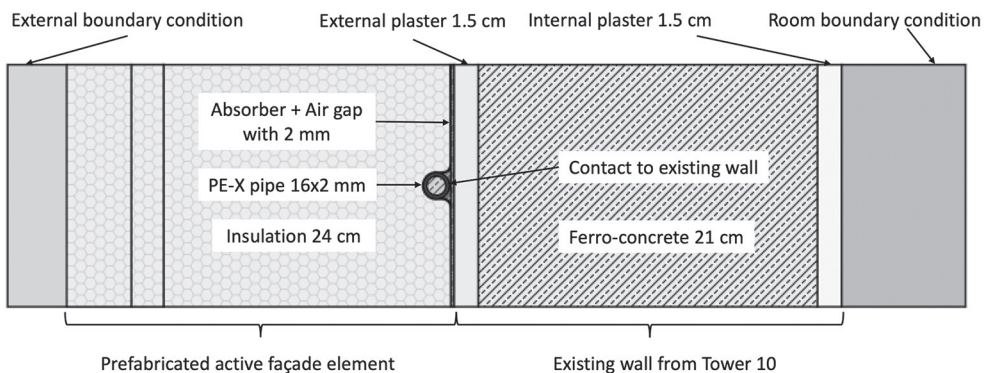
Construction of the prefabricated active façade element with FC (Hengel et al. 2020)
